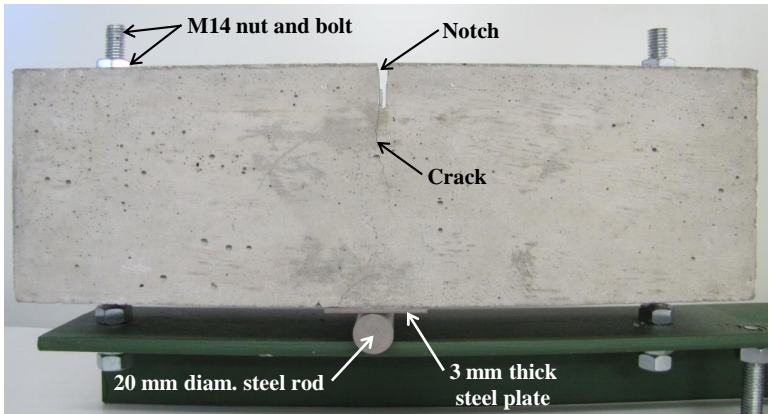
Photograph of a typical cracked beam loading rig set-up
